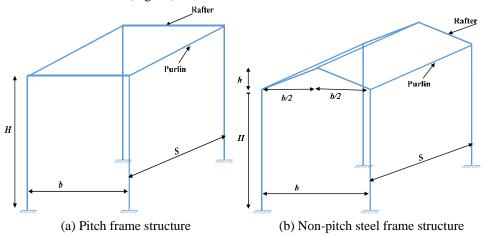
Typical sections of pitch and non-pitch fixed feet open frame
